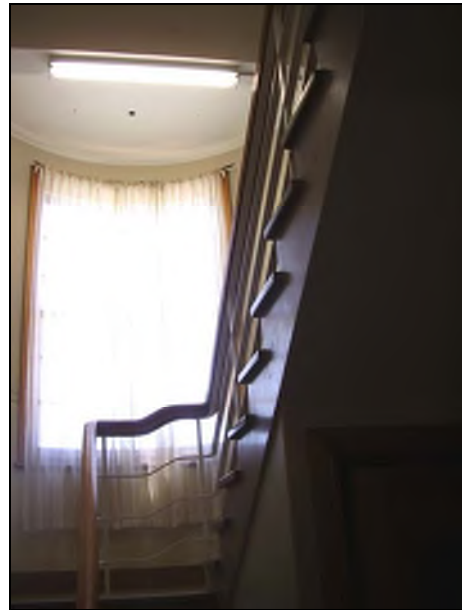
The first floor landing that retains the original steel balustrade with timber handrail and simple finishes.
